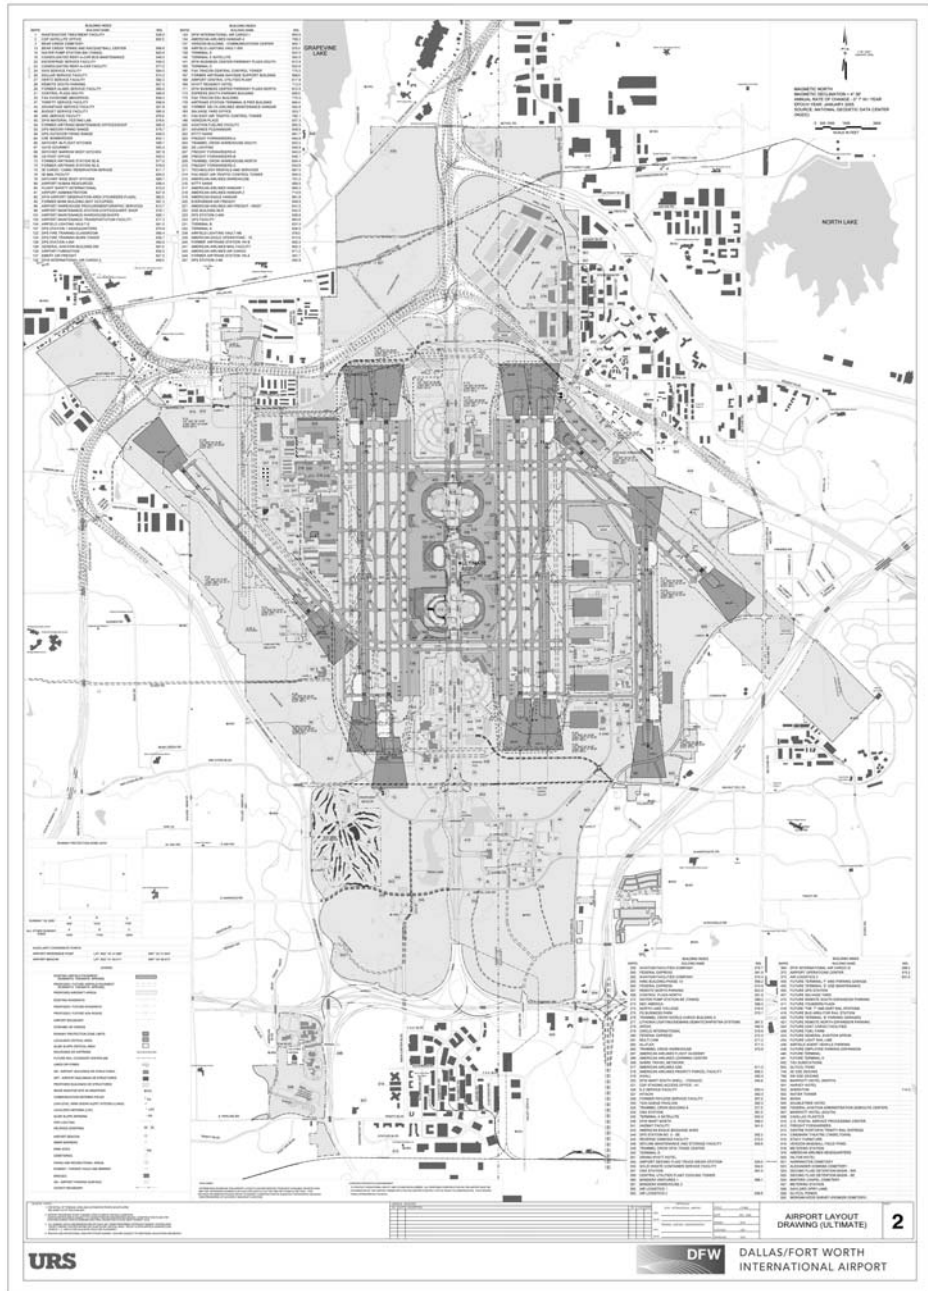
(d) Dallas Fort Worth International Airport—ultimate airport layout plan. (Source: Planning Department, DFW International Airport.)
